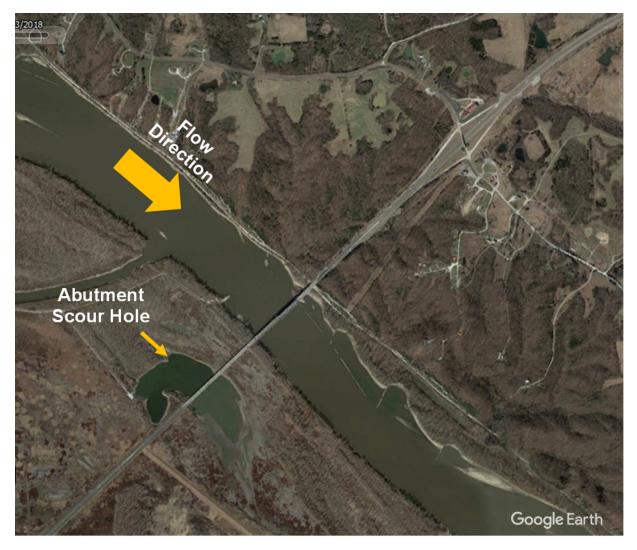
Aerial view of a remnant abutment scour hole at an interstate highway bridge.
